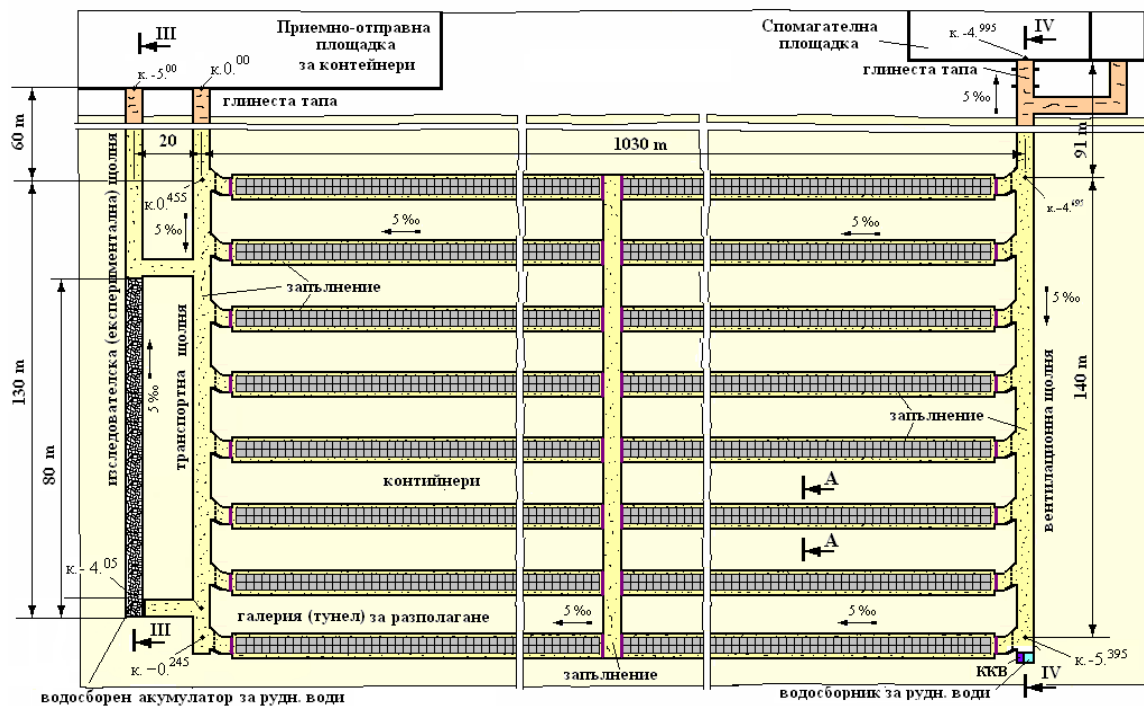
LONGITUDINAL SECTION OF THE FILLED TUNNEL-TYPE REPOSITORY
